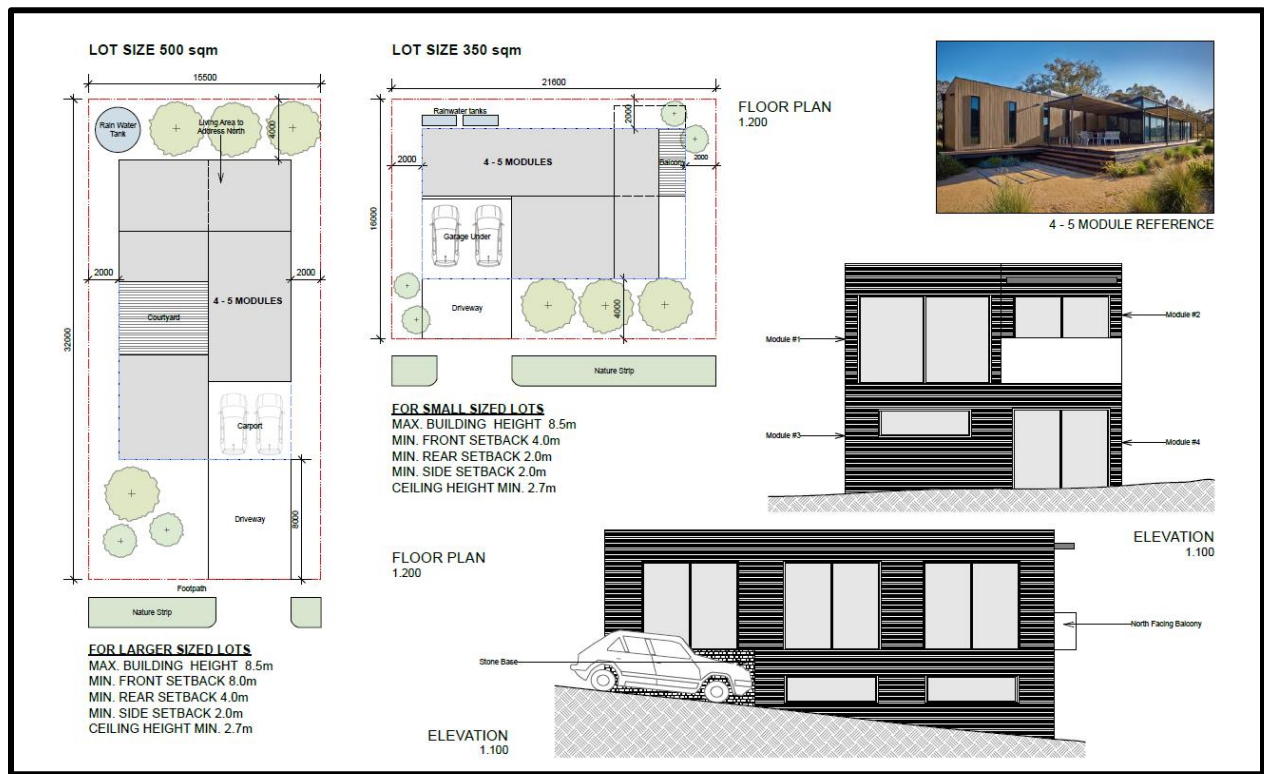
Typical Detached Dwelling (Source: Robert Harwood Architects)
